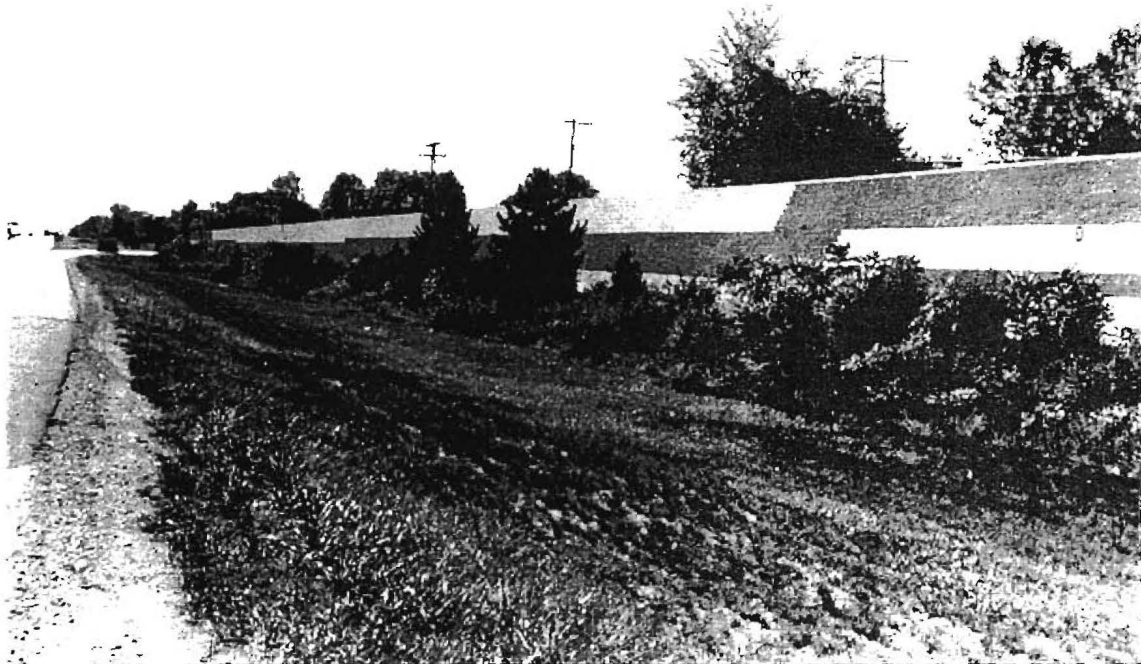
Reinforced Concrete Block on Concrete Base Wall (Michigan DOT)
